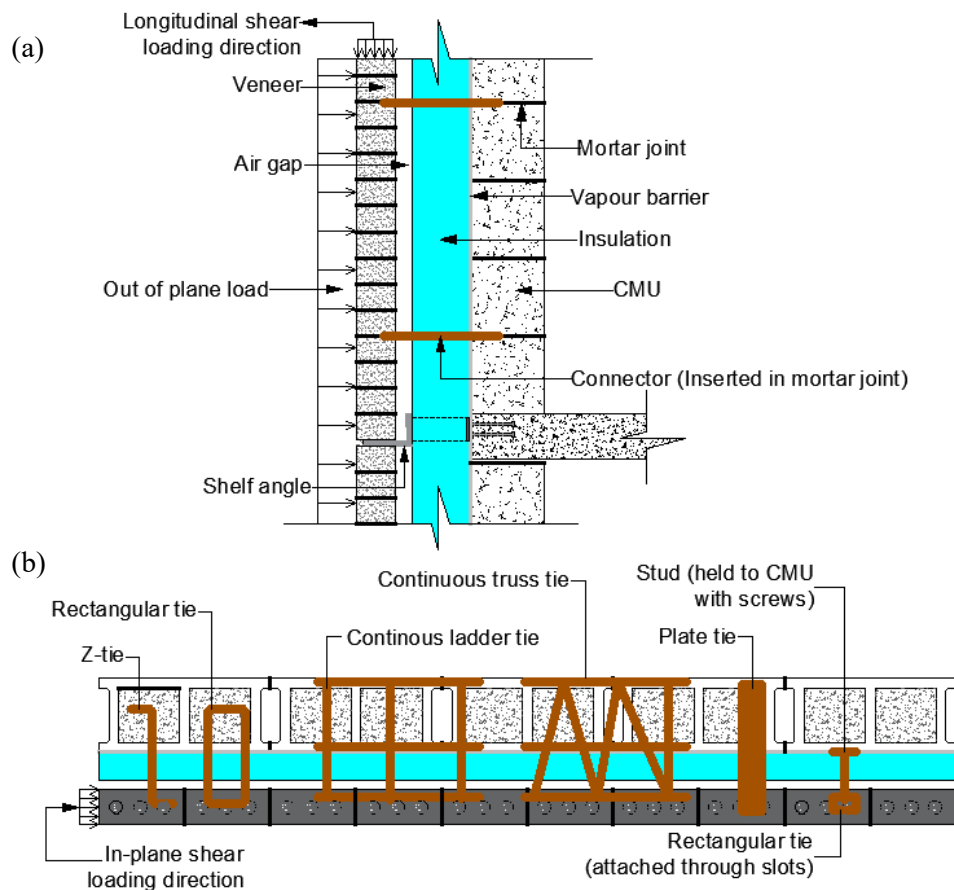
(a) Vertical section of a double wythe cavity wall with typical components (b) Plan view of masonry to masonry wall section showing commonly used ties.
